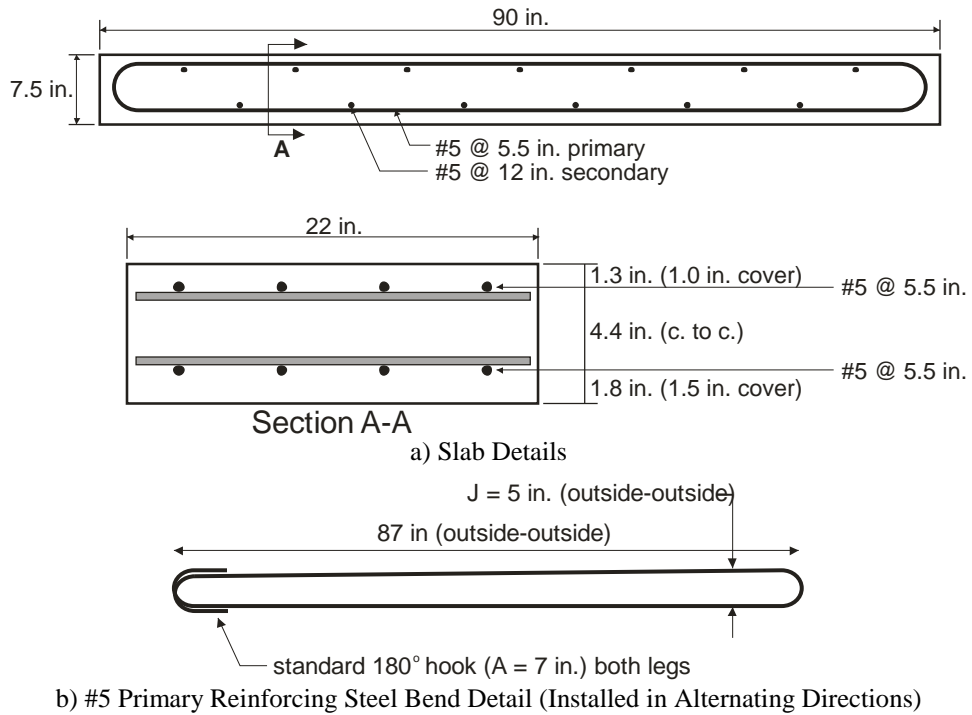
Details of Laboratory Specimens (Slab A as Tested)
